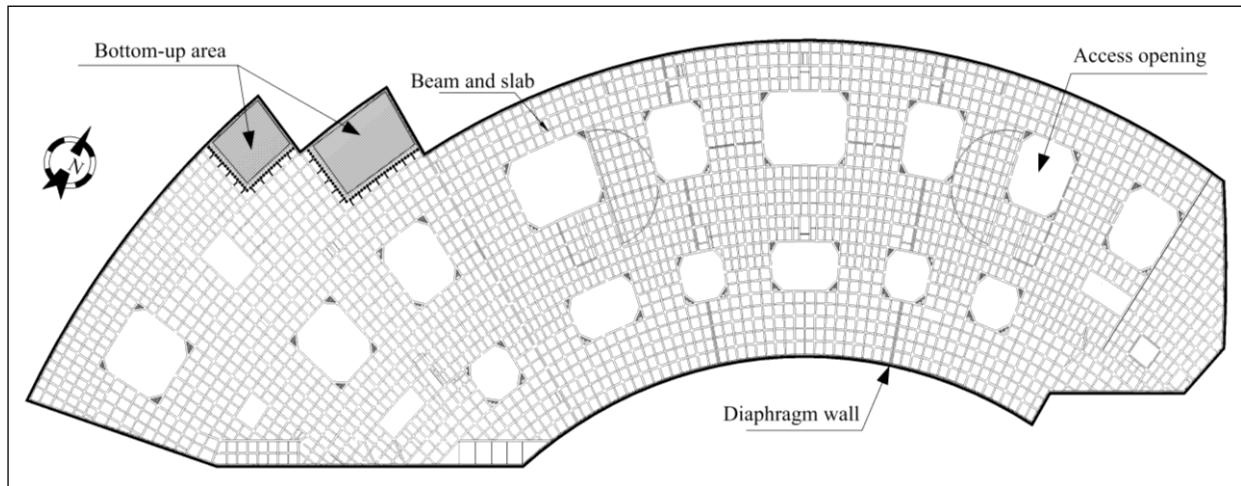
Plan view of the floor slab and beams (Xu 2007)
